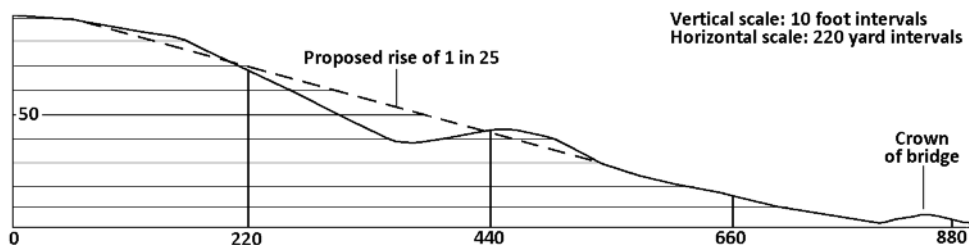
Existing and proposed gradients of part of the proposed road (Route 4) between Shipton Bridge and the turning to Little Horwood (CBS T/3/76/2.T)
